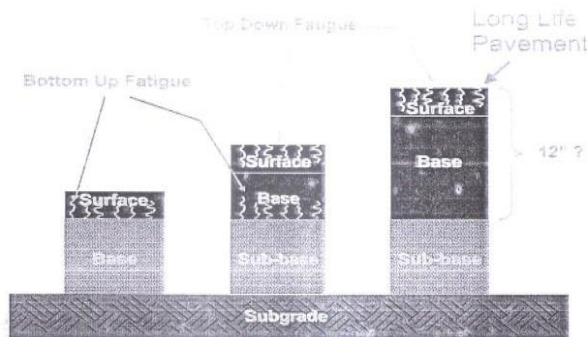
Fatigue Cracking Process in Asphaltic Concrete Pavement, (NCAT, 2008c).
